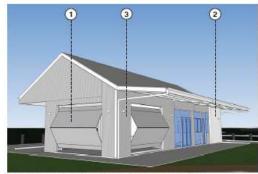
MASTERPLAN'A' OSCART W NEW FACILITY (WHARF ROAD SIDE).
